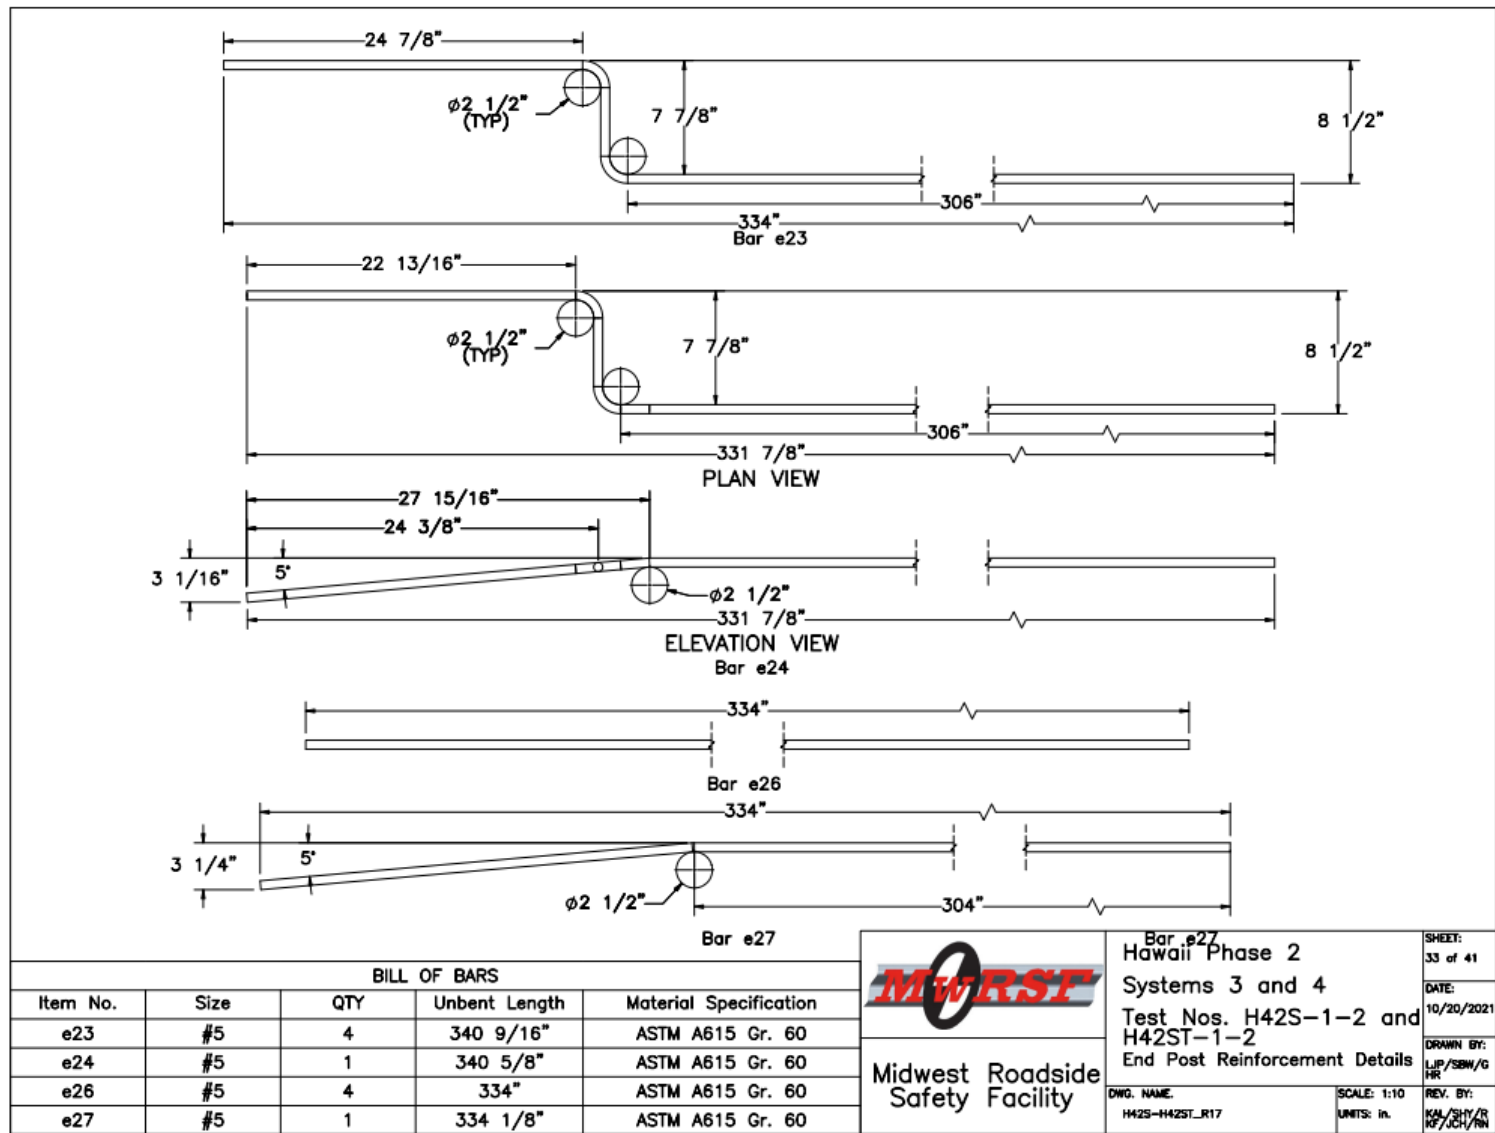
End Post Reinforcement Details, Test Nos. H42ST-1 and H42ST-2
